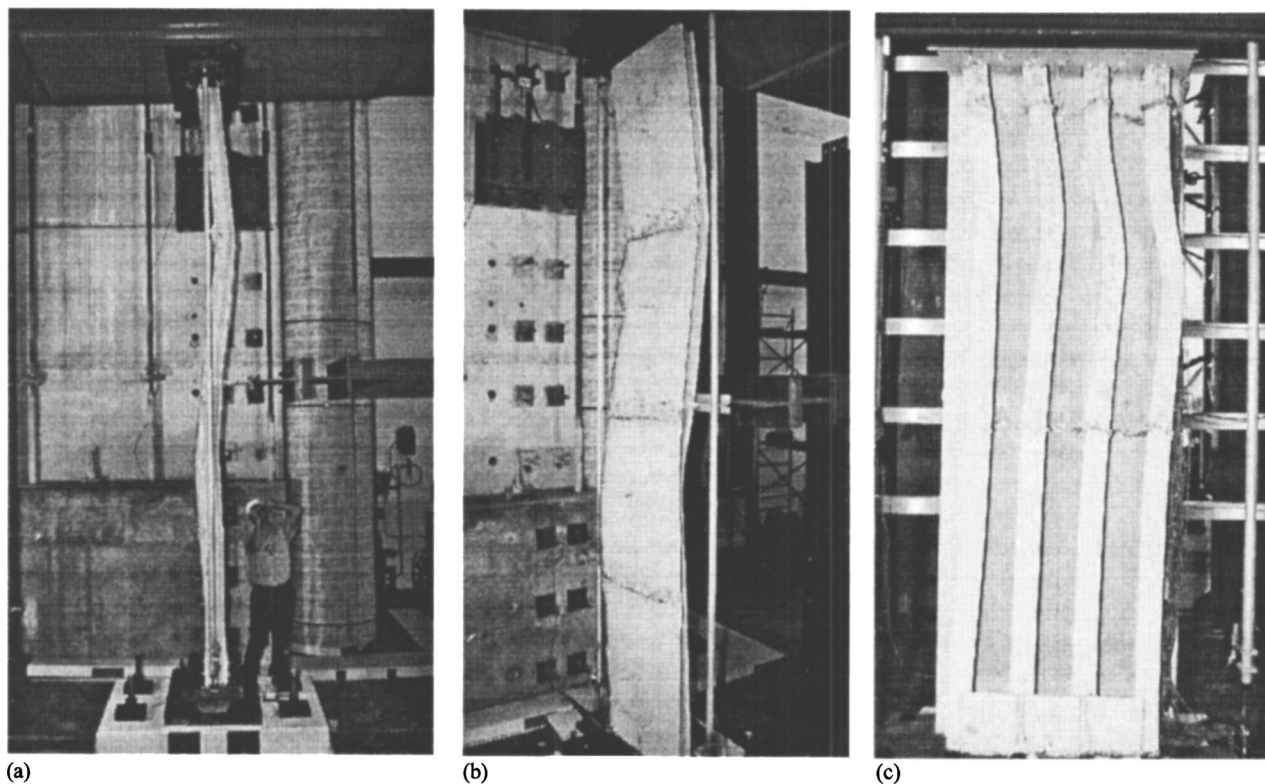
Deformed configurations after testing (Specimen 2): (a) Side view; (b) front view; and (c) lower panel
